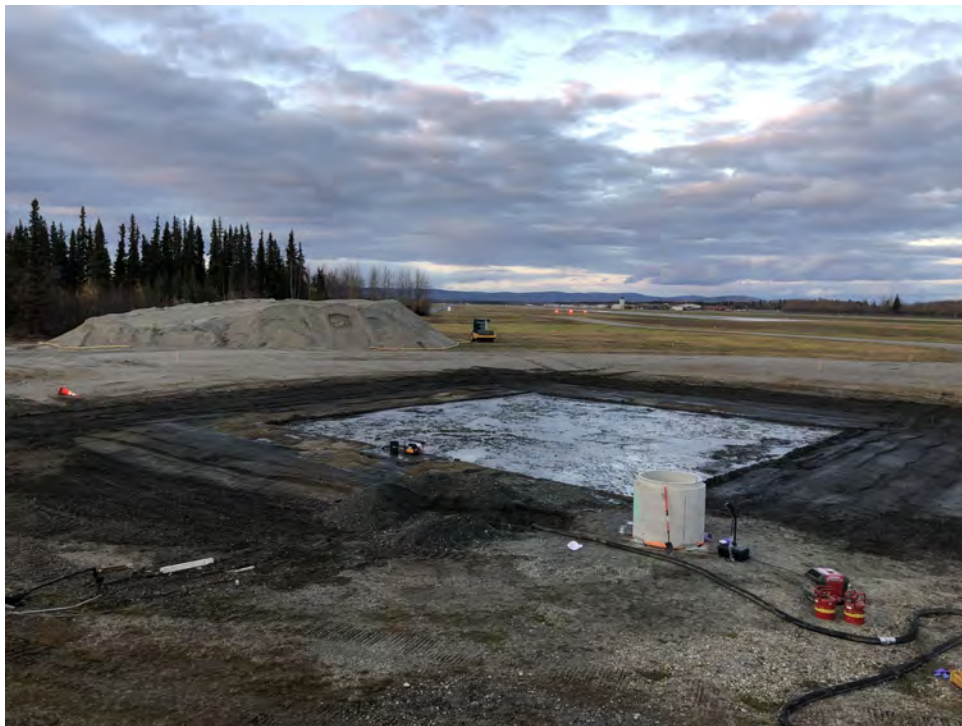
Beginning to Backfill the Fire Training Pit during Dewatering (September 30, 2019)
